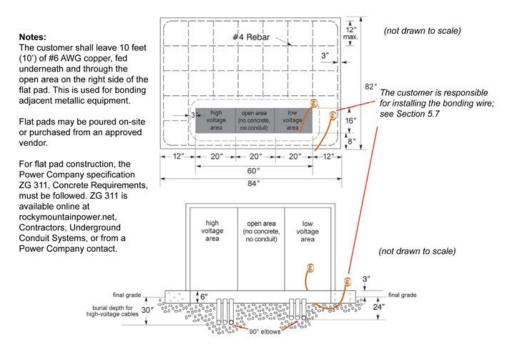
I — Dimensions and Installation of a Three-Phase Transformer Flat Pad Notes:
